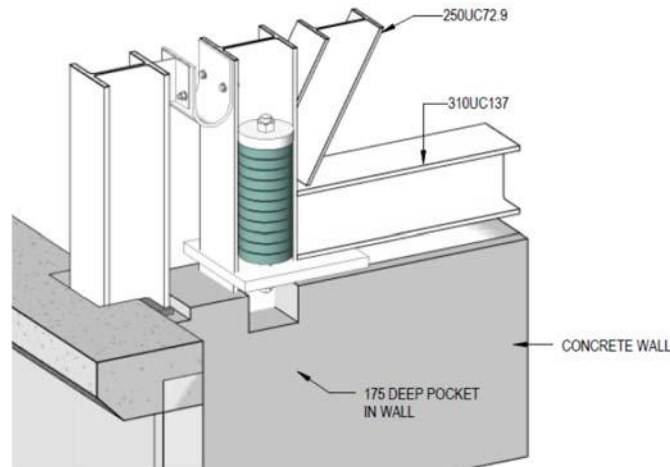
CRSBF connection to foundations and cast in steel frame components.
